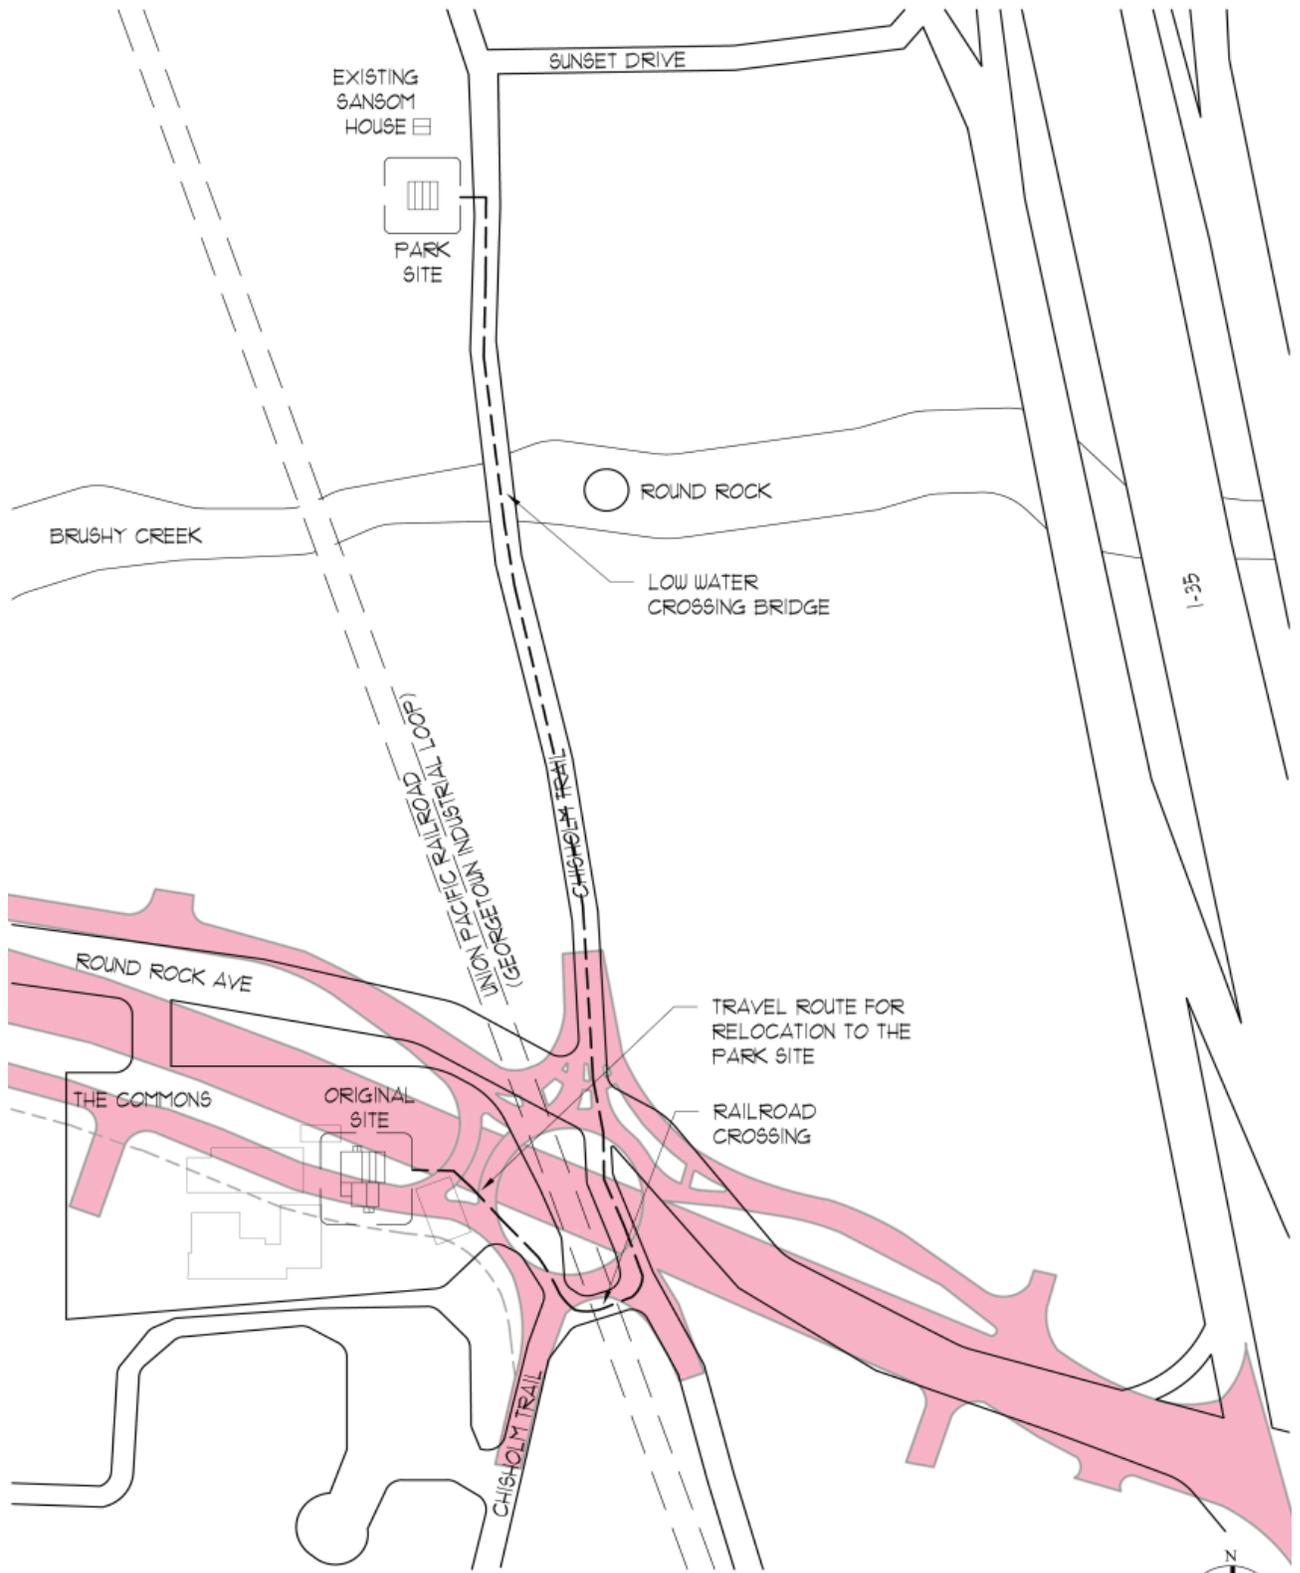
Site Plan, showing the Commons Site and the proposed RM 620 improvements in red (Drawing by ARCHITEXAS, 2016)
